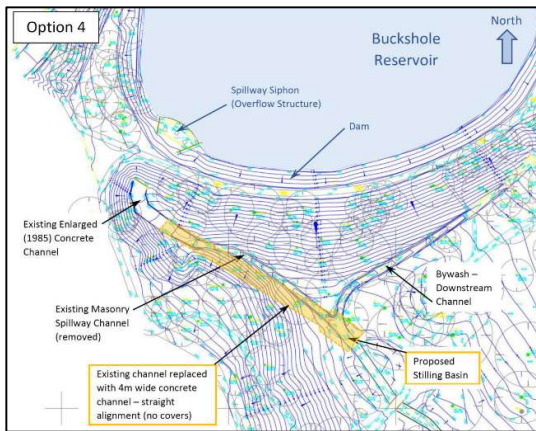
Short-listed option 4: proposed new spillway channel (straight alignment)
